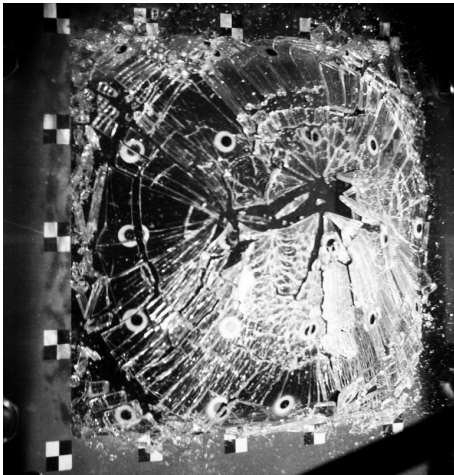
Fracture progress for test MG-5.7-03.
